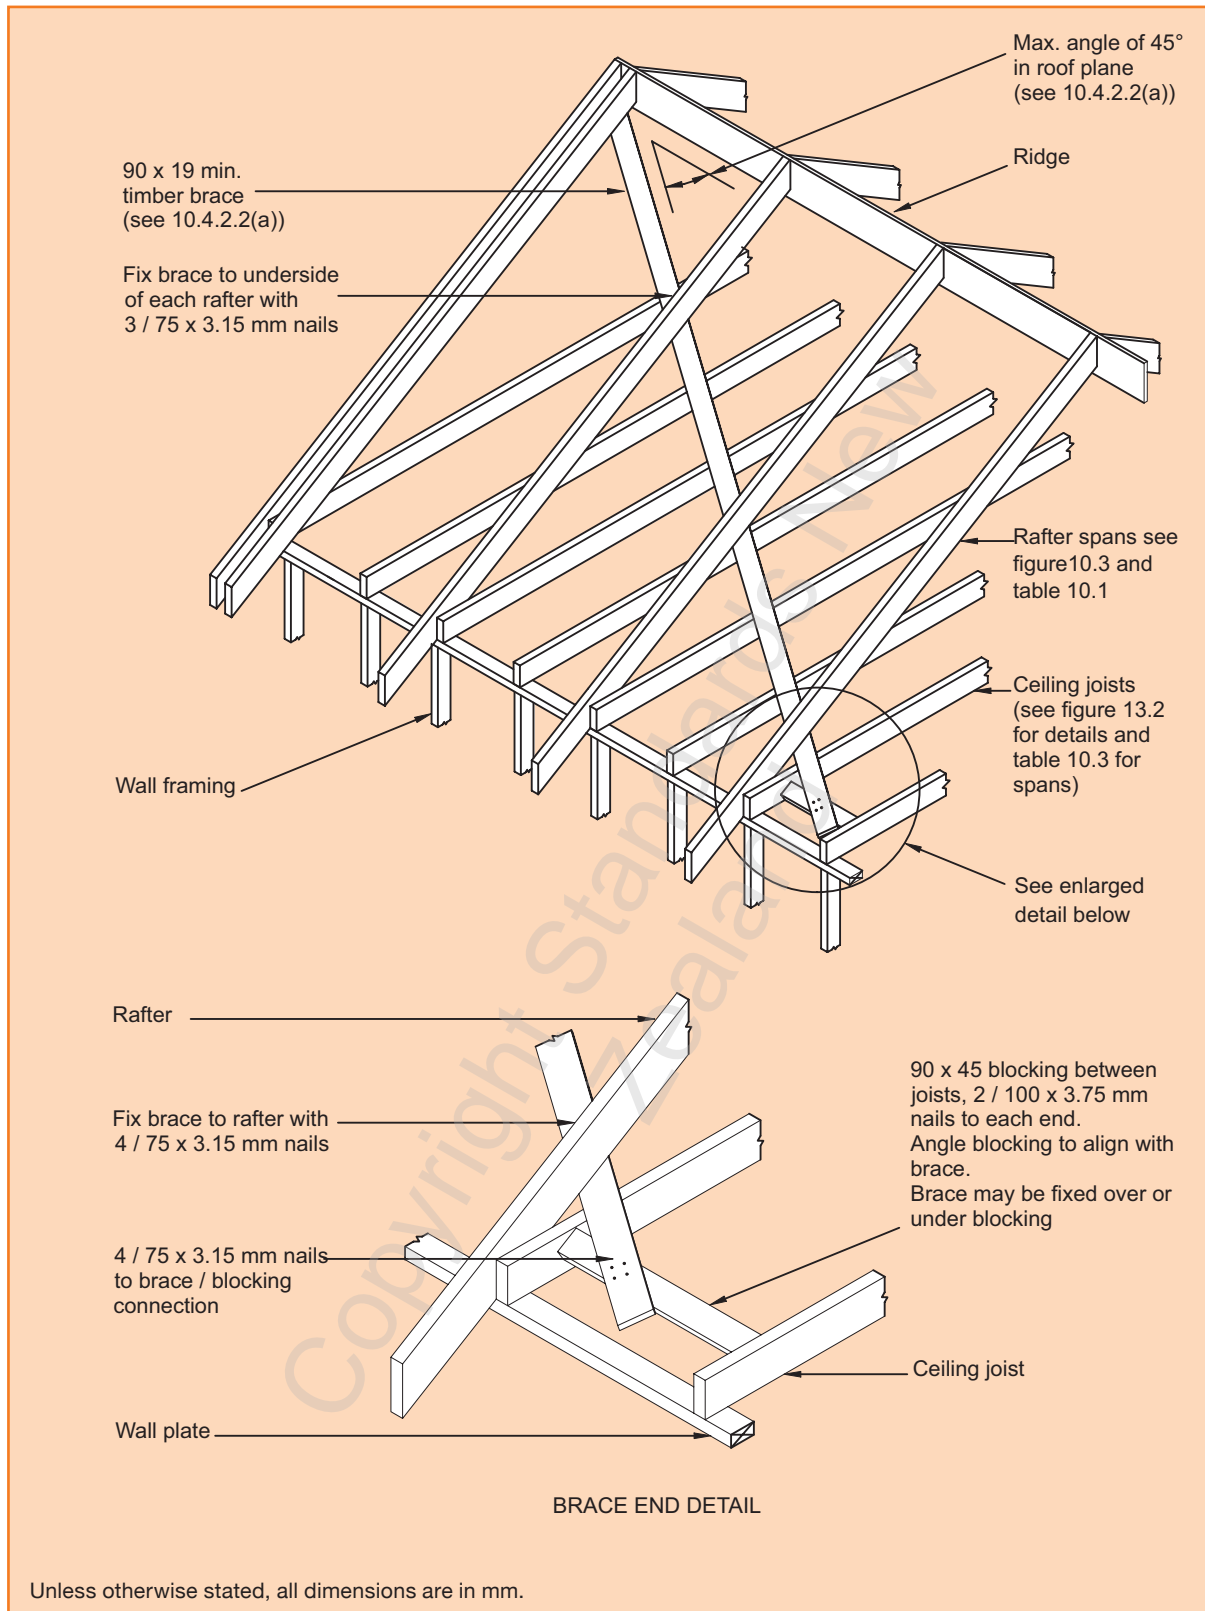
Roof plane diagonal brace – Timber (see 10.4.2)
